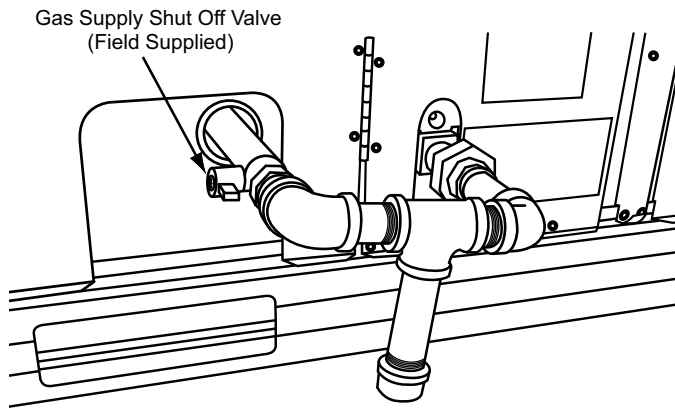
Gas Supply Shut-Off Valve Location – 3 to 12-1/2 Ton Units (Thru-the-base gas supply shown)
